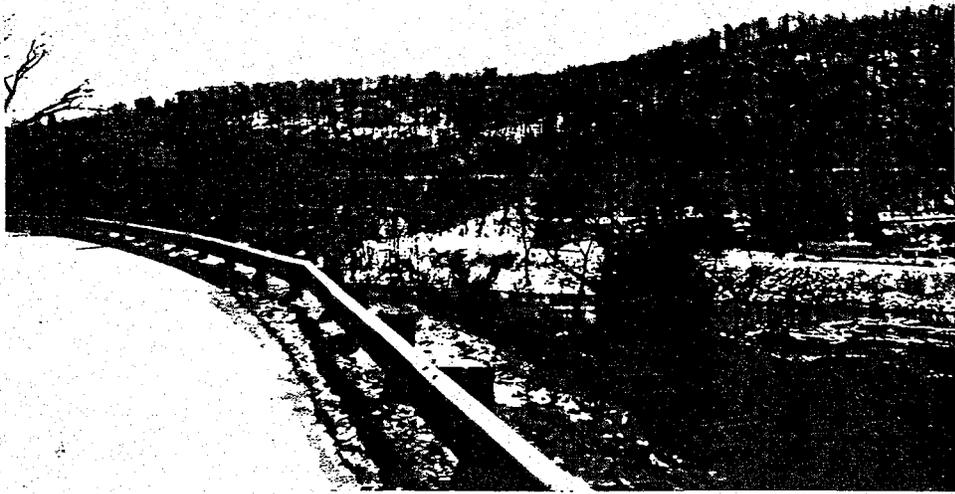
View west to Conrail from Highway 34 on east side of Housatonic River. M.P. 1.7 to 2.1.
